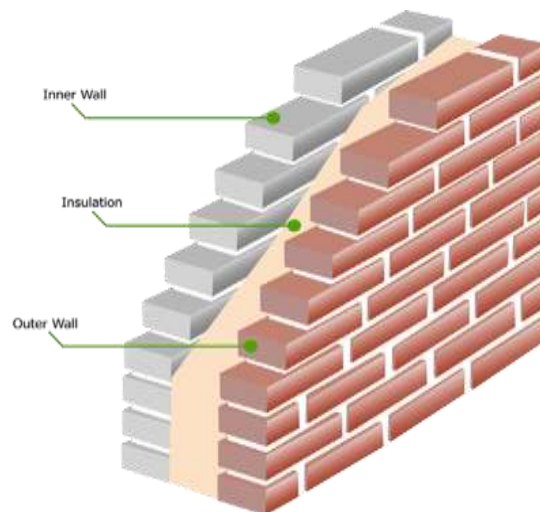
An insulated wall cavity, with the insulation material within the inner and outer wall.
